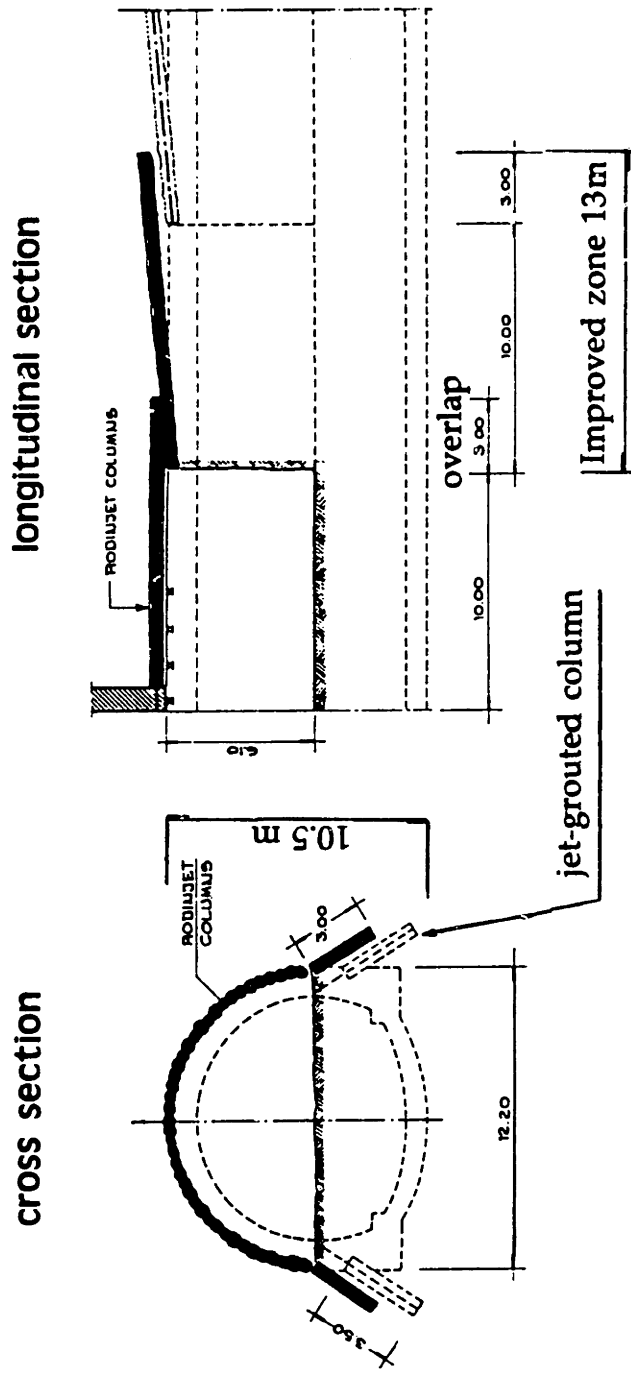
Cross and longitudinal sections: Campiolo Tunnel (Mongilardi et al., 1986)
